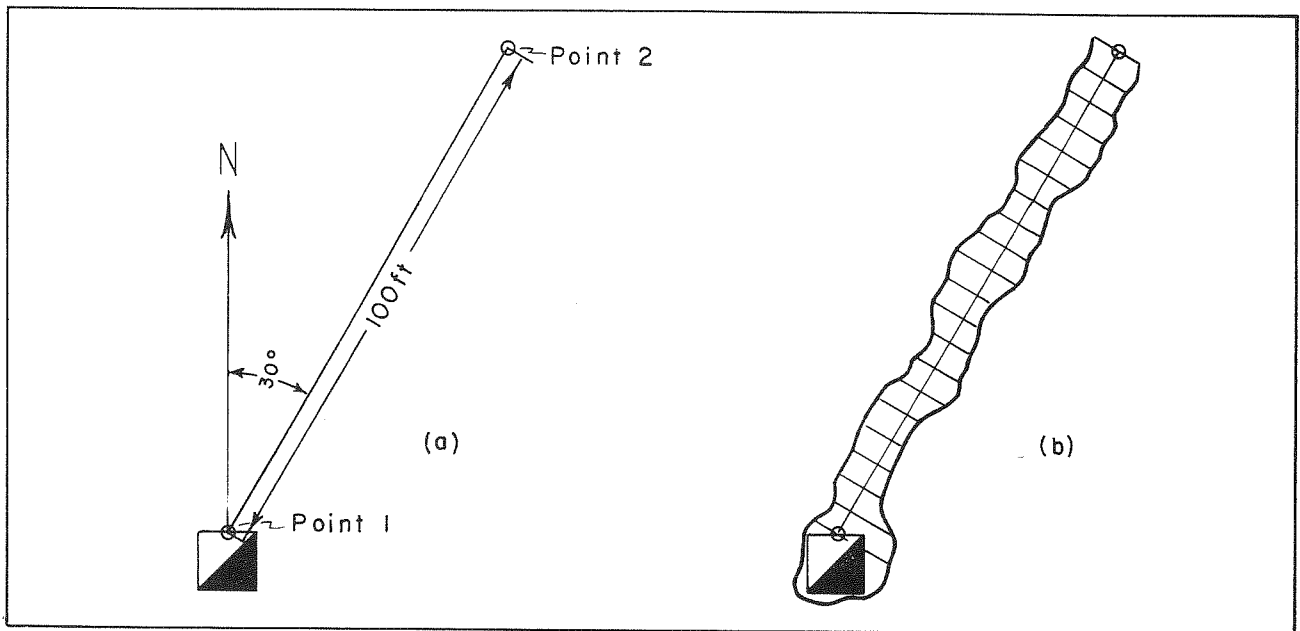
Plan showing method of outlining horizontal workings.
